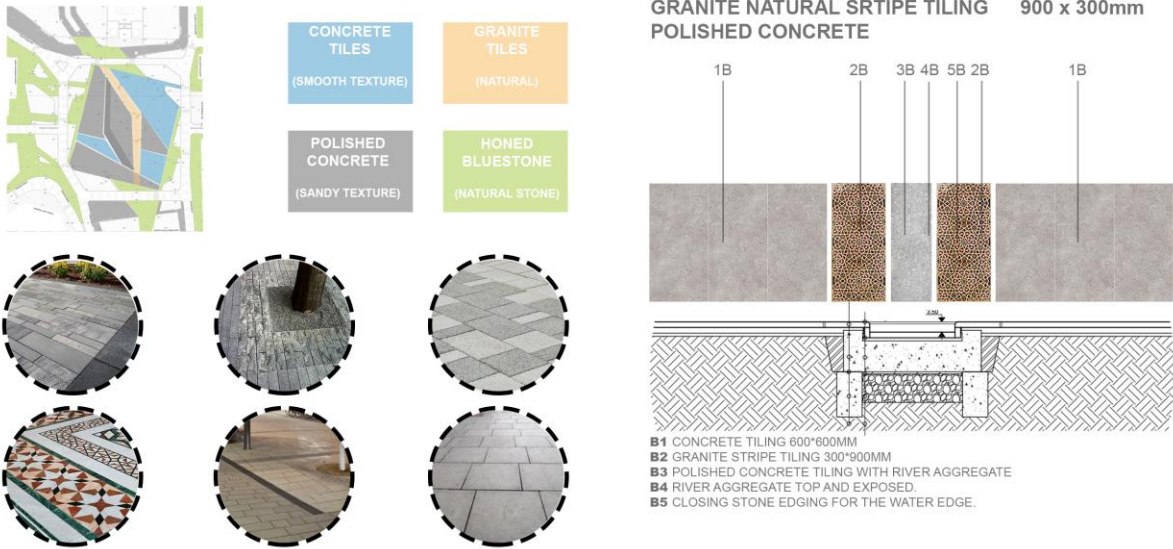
Detailed drawings and information of the new Pavement materials implemented in the new design (My work collection)
